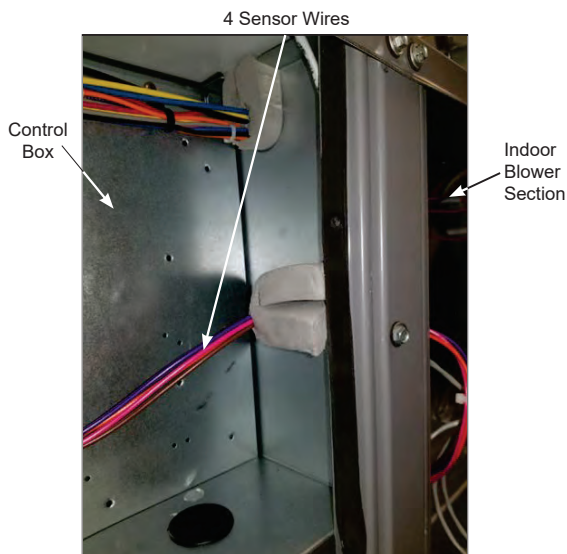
Route 4 Sensor Wires to Indoor Blower Section
